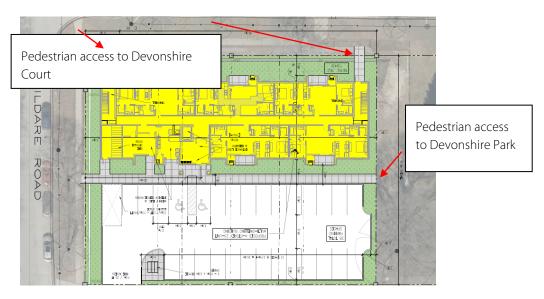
& 21: Aerial view of the former St. George's Church complex in 2017; (Source: Google Maps, 2021); Coloured site plan of proposed development to compare building footprint of Devonshire Court (Source: ADA Inc. Architect, 2021).
